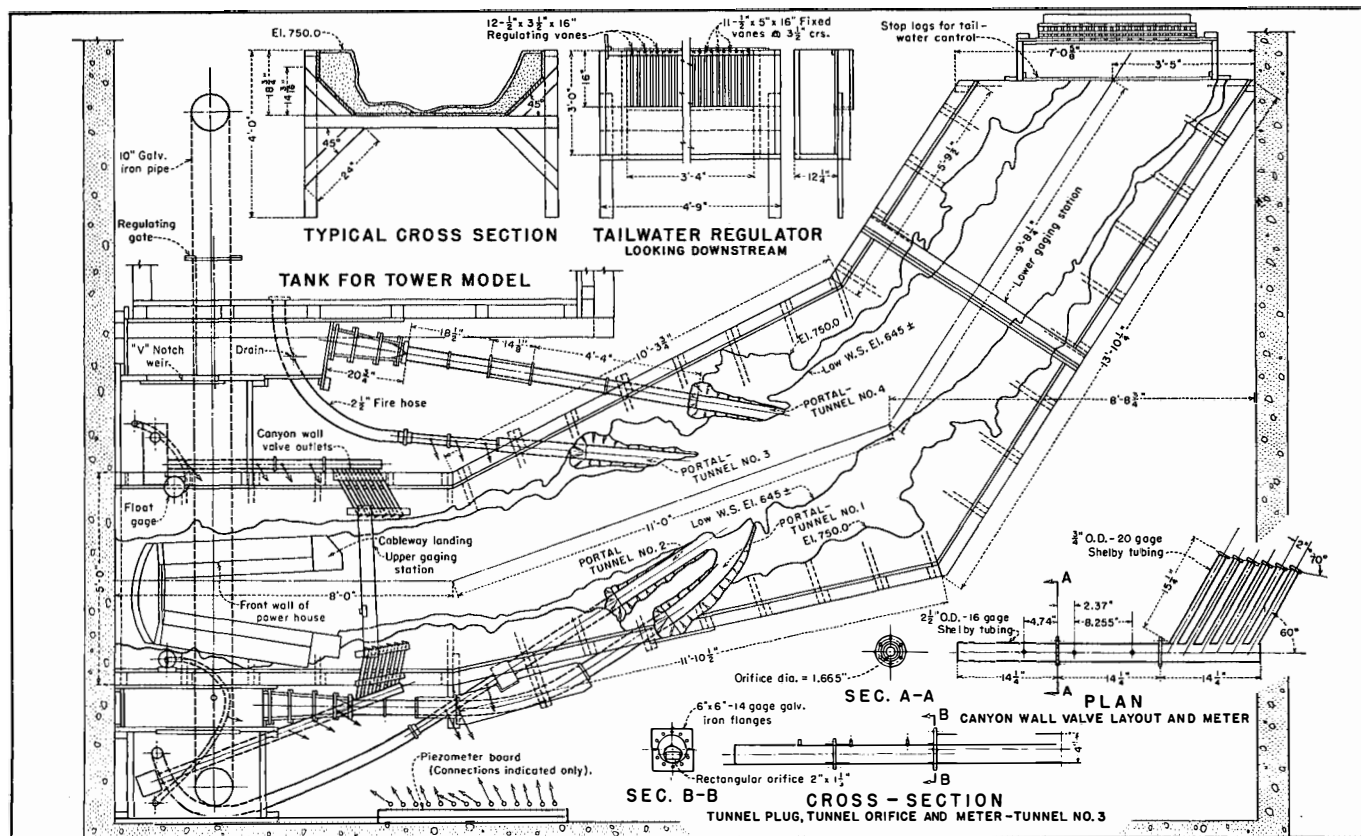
PLAN AND DETAILS OF RIVER MODEL, SCALE 1:150
